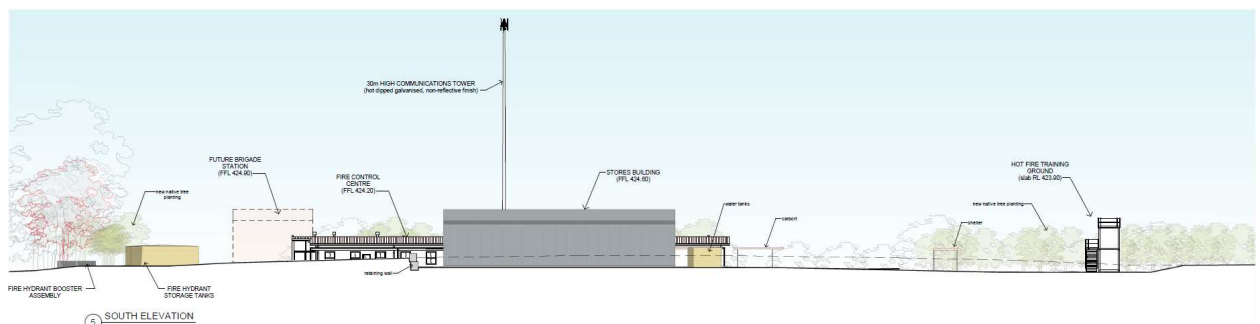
South Elevation (View from Racecourse track and future proposed road)
